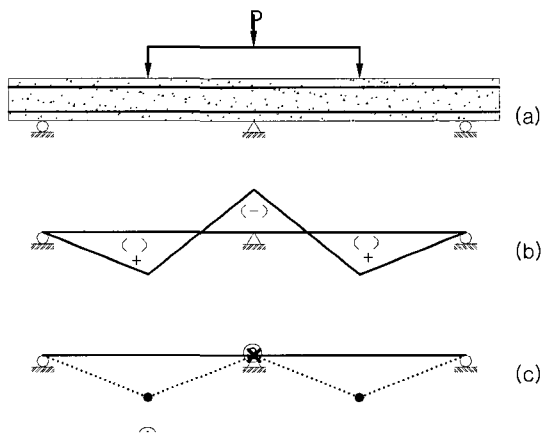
a) Bridge deck model, b) Bending moment diagram, c) Failure mechanism of HRS (① plastic hinge of steel bar, ② rupture of FRP bar or crush of concrete)
